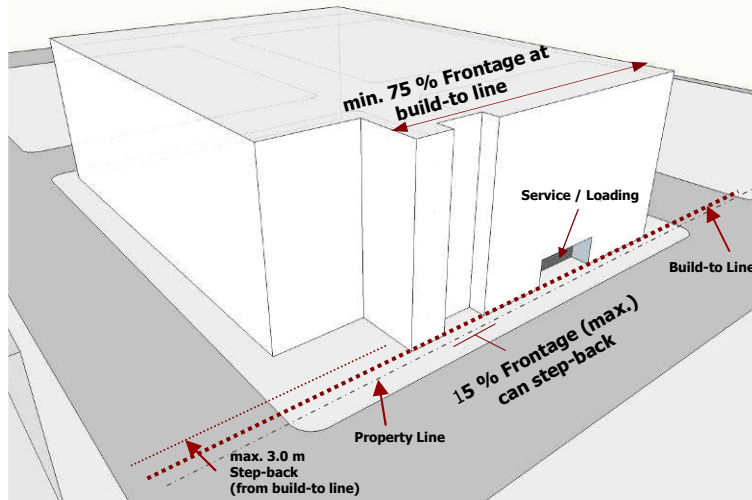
Illustration of a building streetwall positioned on 'B' frontage.
